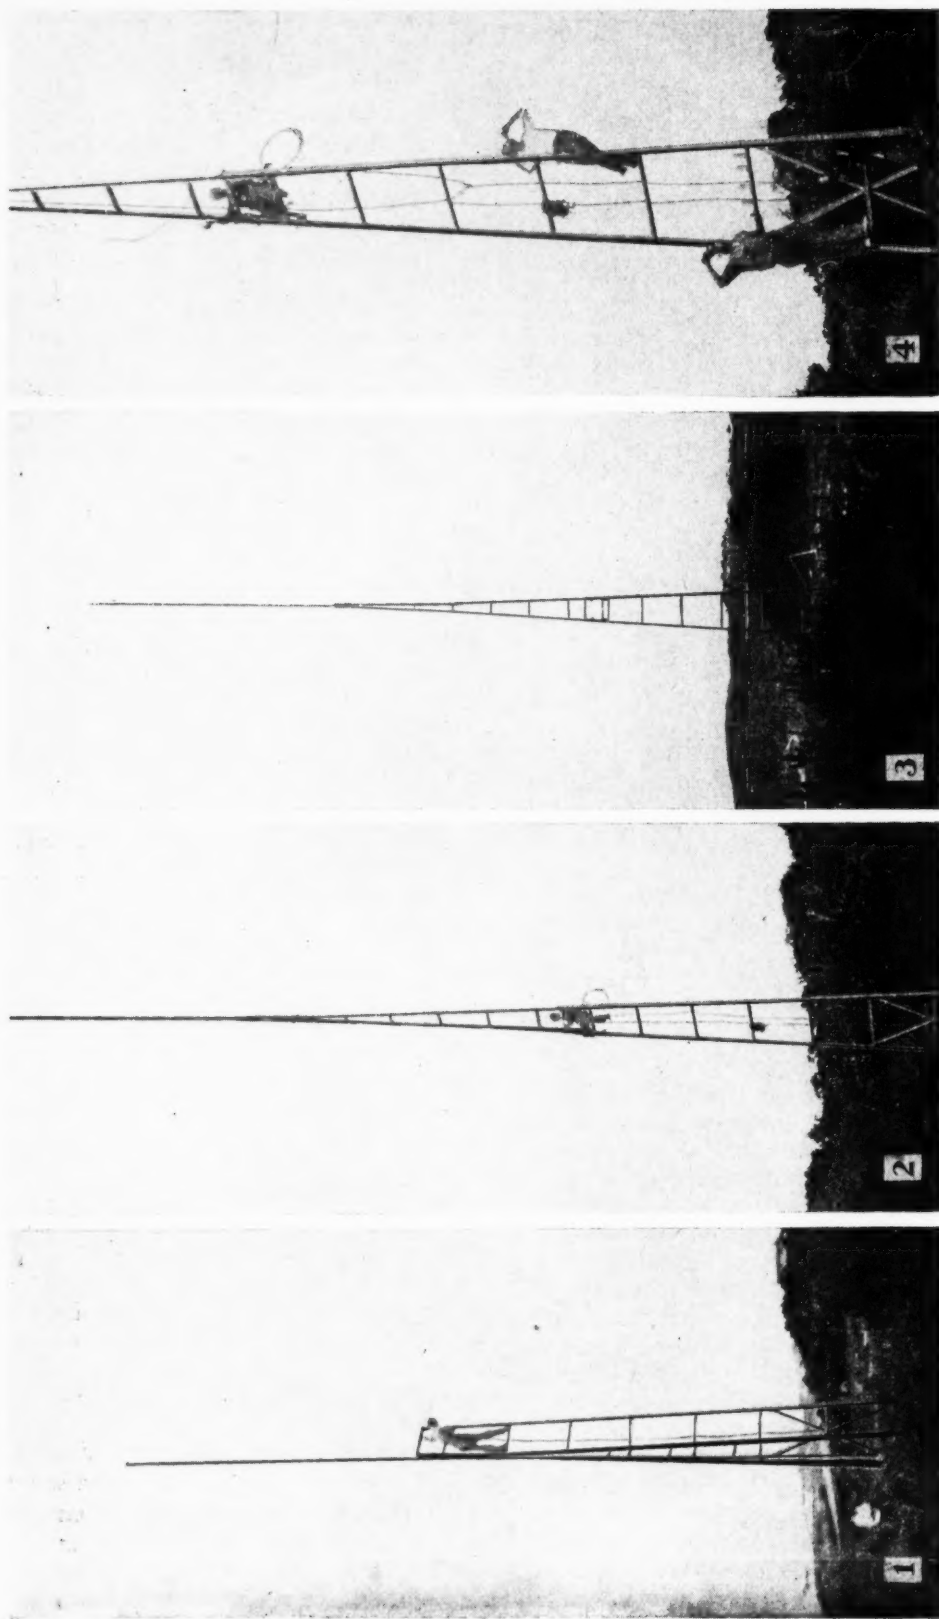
shows the bottom section guyed in place and the top section raised on the ground. Figure 2 shows the top section being bolted into place. Figure 3 shows the completed job, and Figure 4 the "steam beer" method of pole raising.
